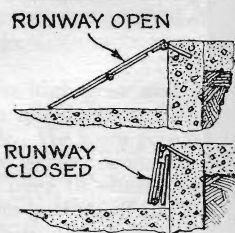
Sectional diagram showing runway open and closed and details of its construction.
